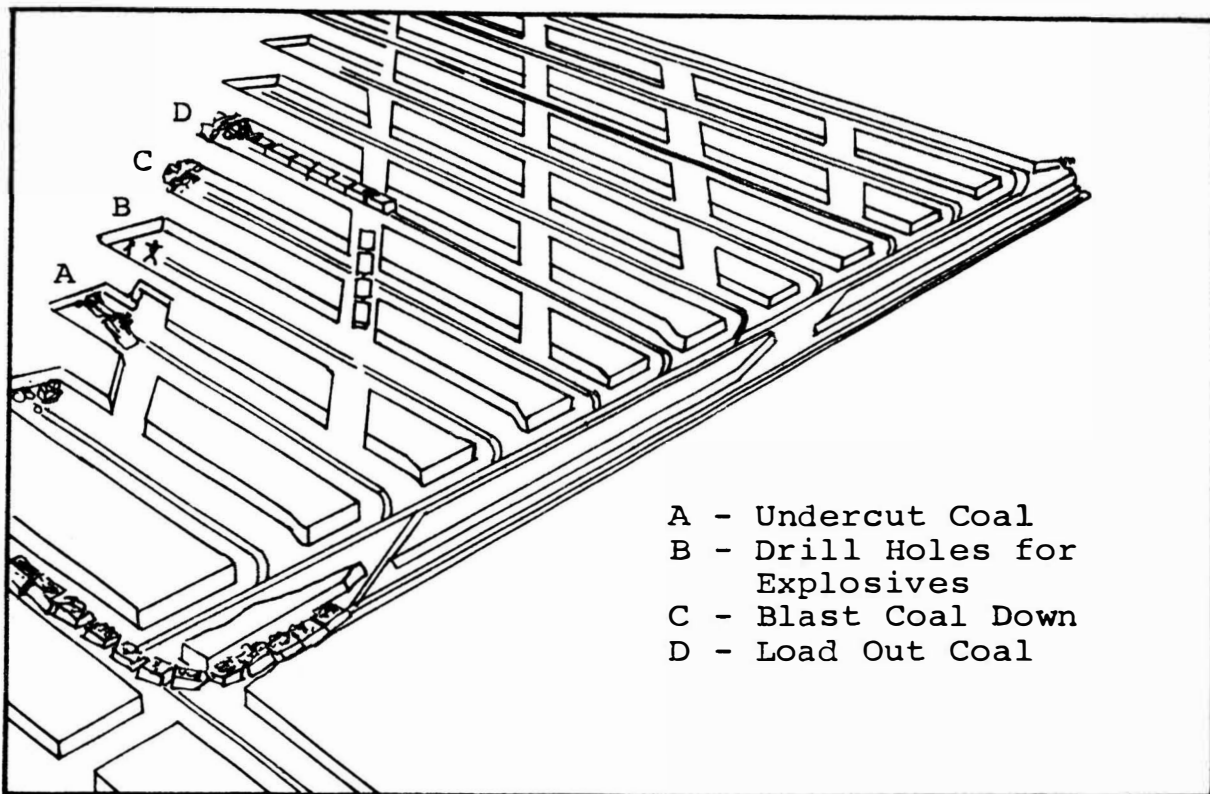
Layout of a Room and Pillar Mine Using Conventional Techniques (4).
